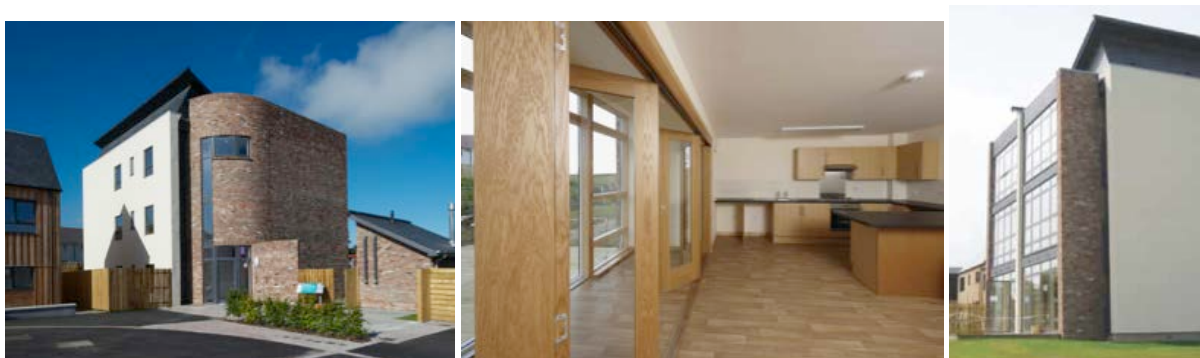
6: House Type D, south and west view of communal stair with dwellings behind, internal view of living room, kitchen and sunspace, west façade showing external view of the sunspace.
